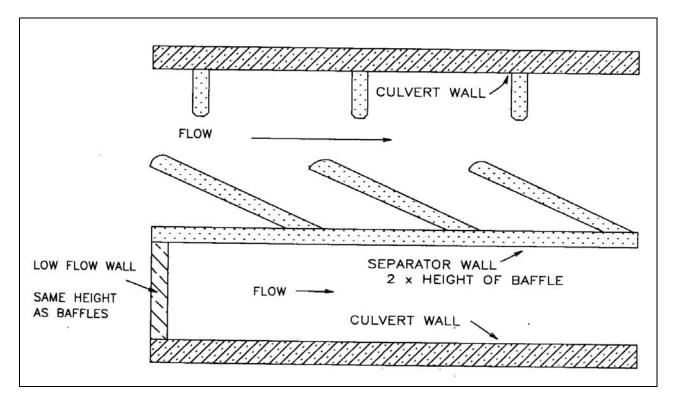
Washington baffles with a separator wall. (*Stream Enhancement Guide*, British Columbia Ministry of Environment, 1980, p. 42).
